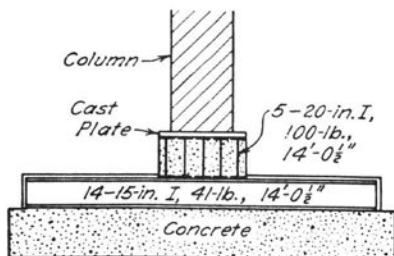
SECTION THROUGH I-BEAM FOOTING OF MARQUETTE BUILDING
